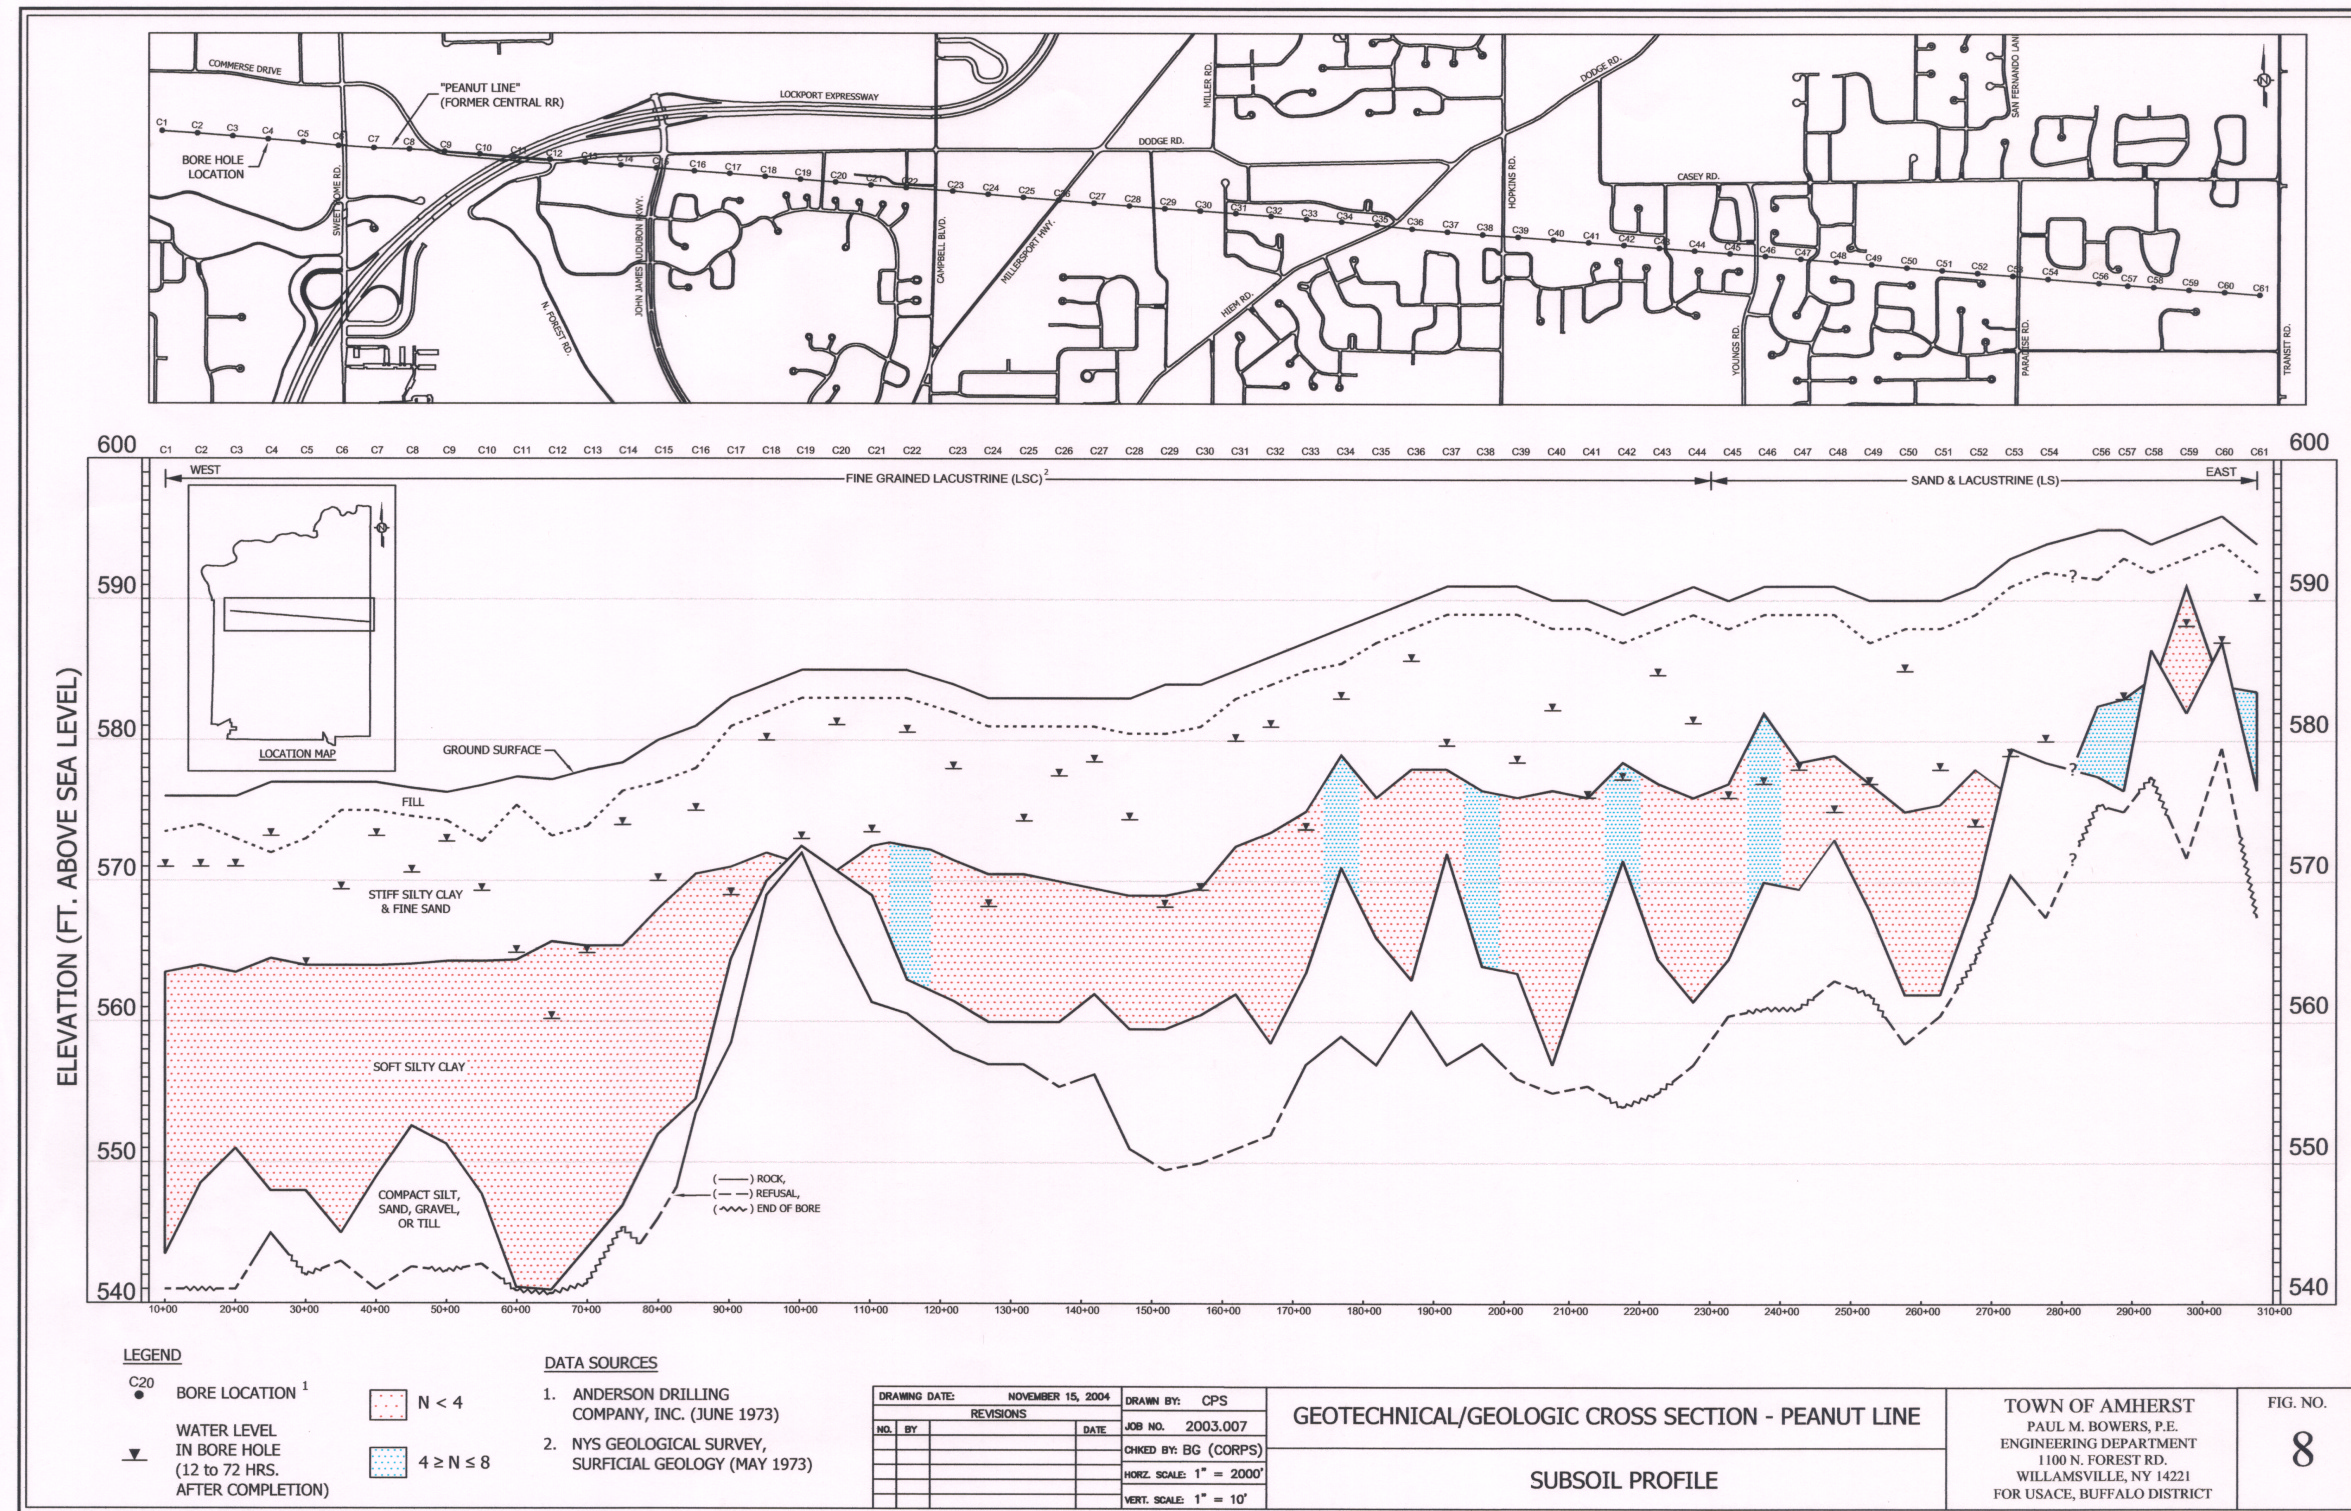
Geotechnical/geologic cross-section through central Amherst along former New York Railroad, or "Peanut Line." Upper section shows aerial view of borehole locations. Cross-section shows elevation of ground surface and depths of fill, soft stratum (if present), till, and borehole termination (end-of-borehole, refusal, or rock). Stippling shows thickness of soft stratum (red) and semi-soft stratum (blue), generally silty clay. Micro-topography of the bedrock and surface appear to influence the location of softer stratum. Subsurface condition becomes more heterogeneous in east towards Clarence.
